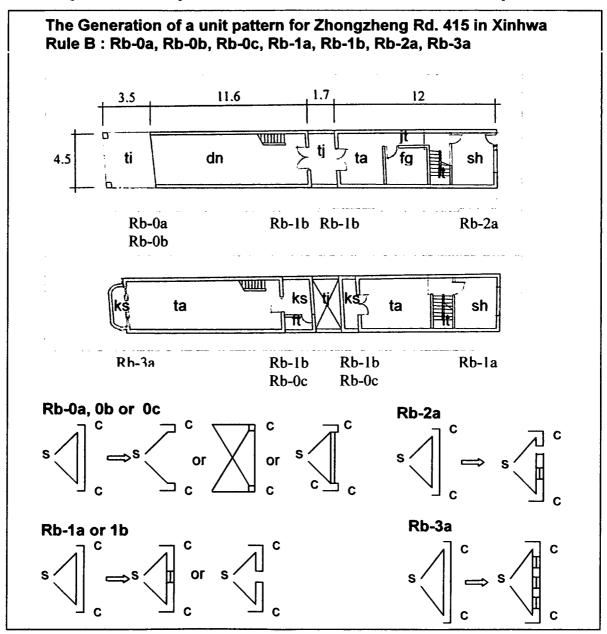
32 Rule B for illustrating the openings on outer walls of floor plans for Zhongzheng Rd. 415 in Xinhwa
